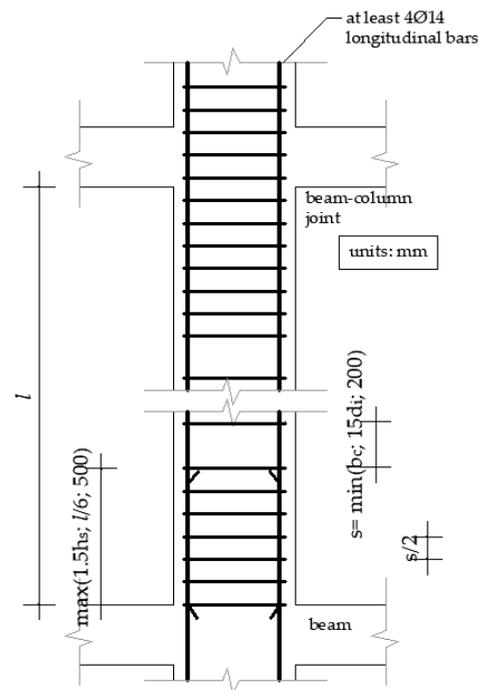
Seismic detailing requirements for columns in RC frames in accordance with the PTN-S code.
